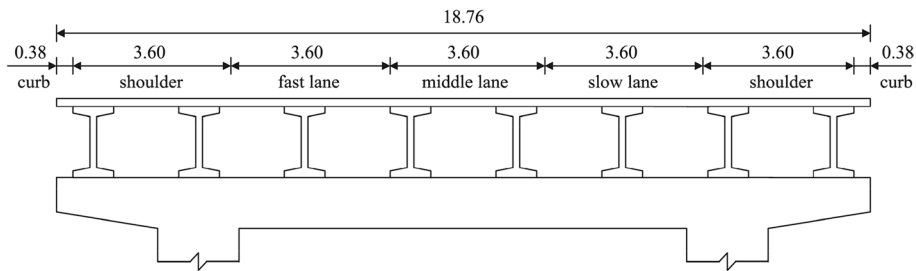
Location of traffic lanes on the prototype bridge (unit: m)
